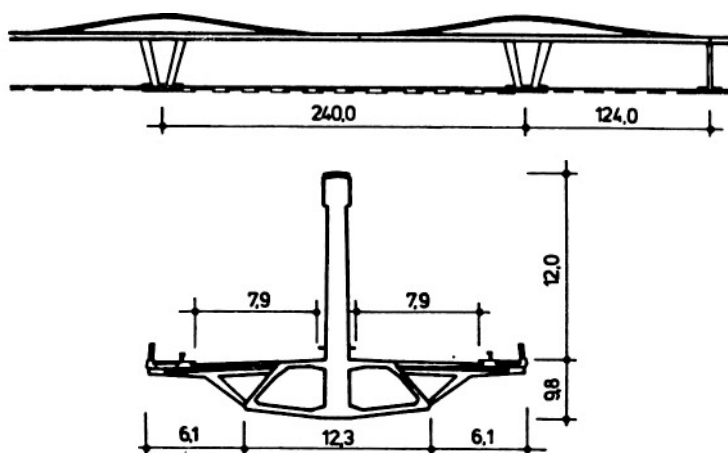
Concrete cable-stayed bridge over the Seine River in Brotonne [223].
